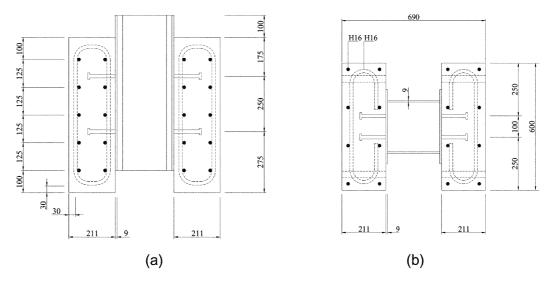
Details of push-out specimen (units: mm): (a) Front view, (b) Plan view
